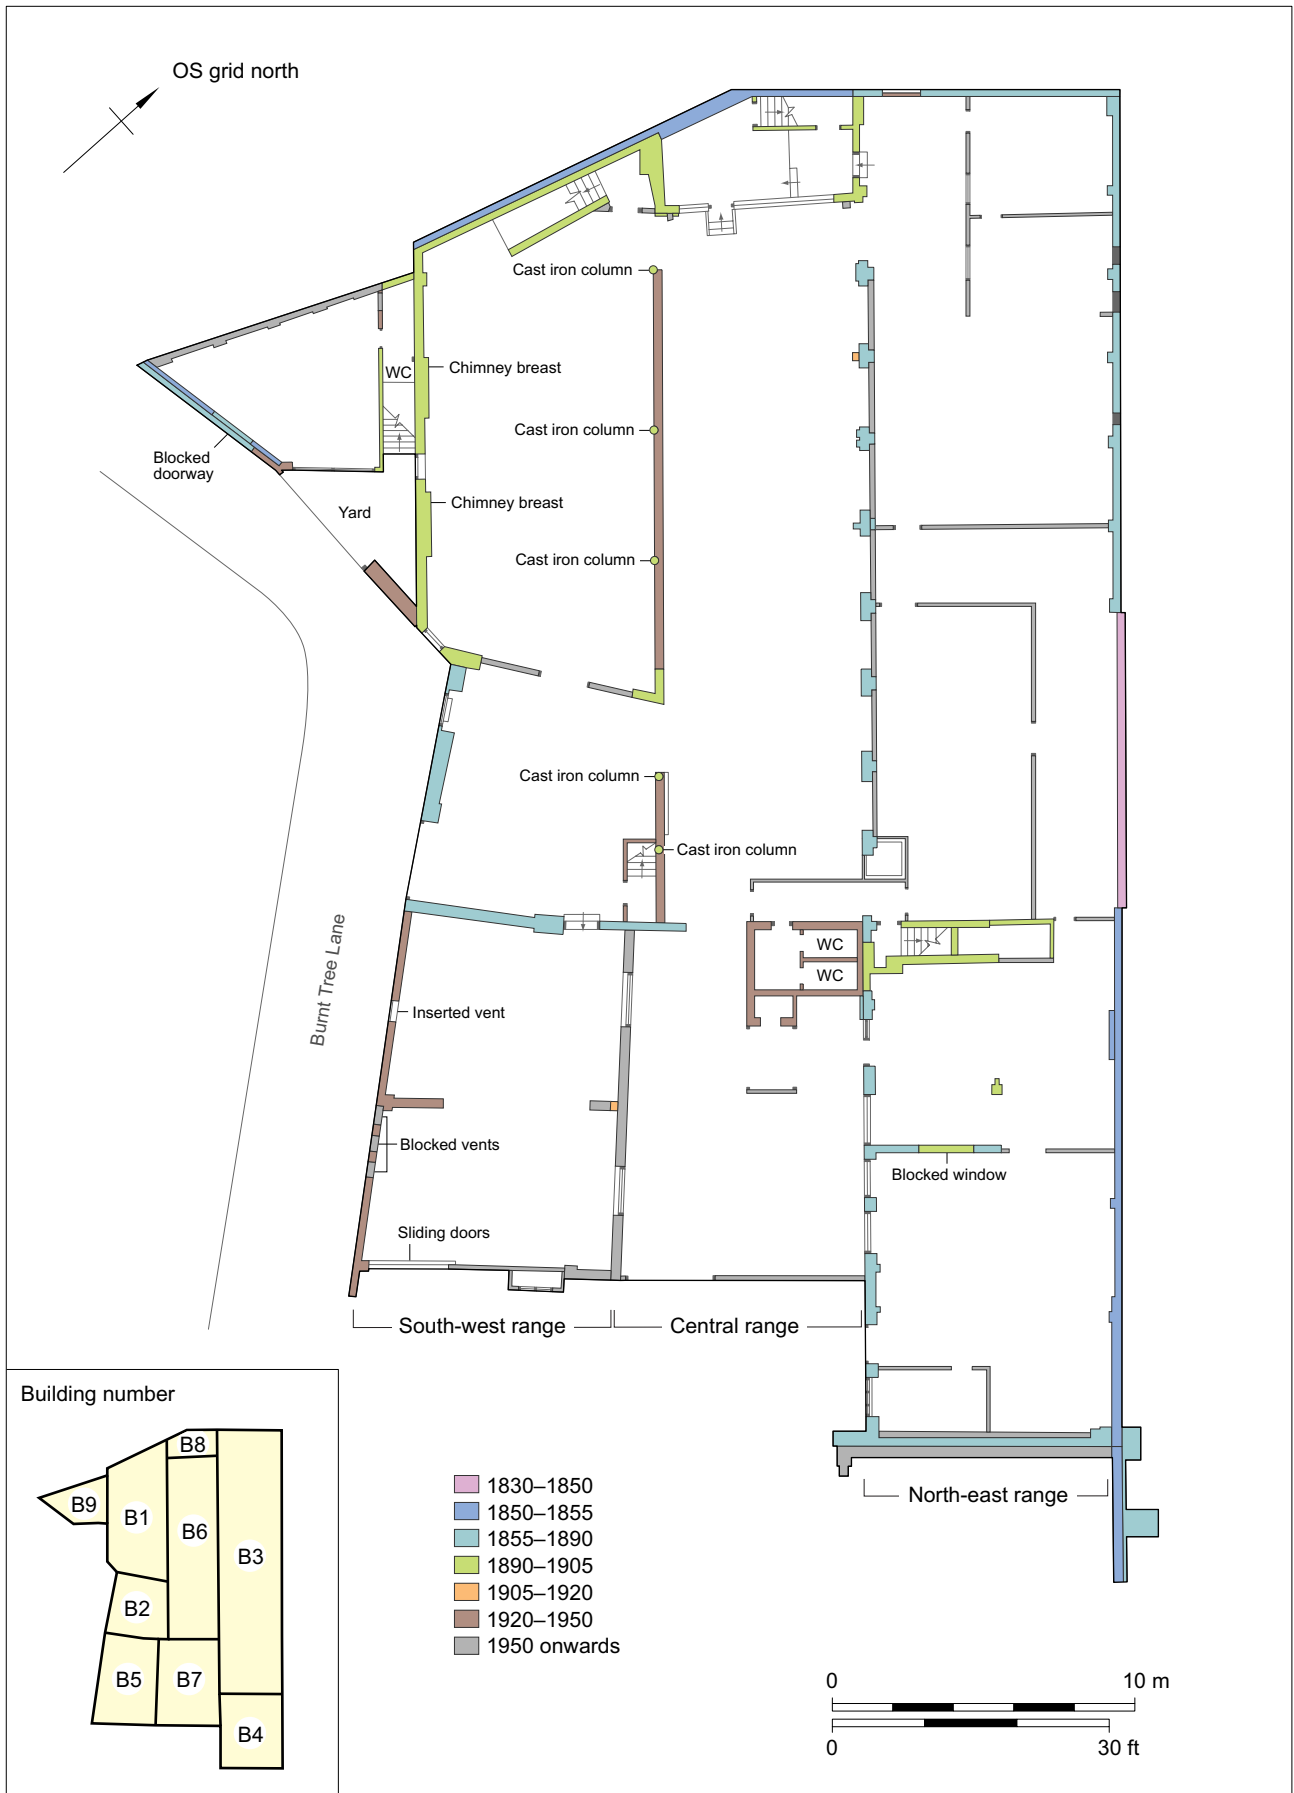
Hoyle Street Works, building recording, ground-floor plan
